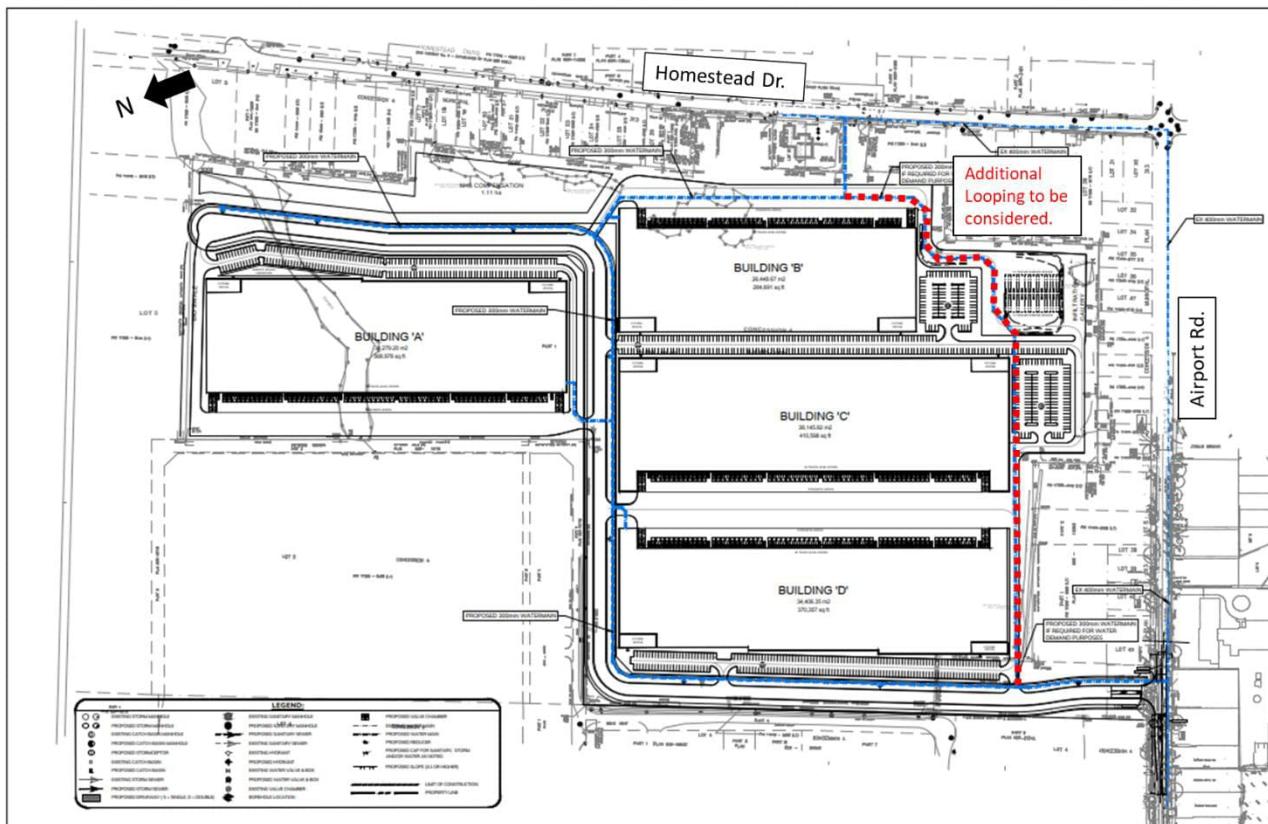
The Proposed 3054 Homestead Drive Development Site Plan
